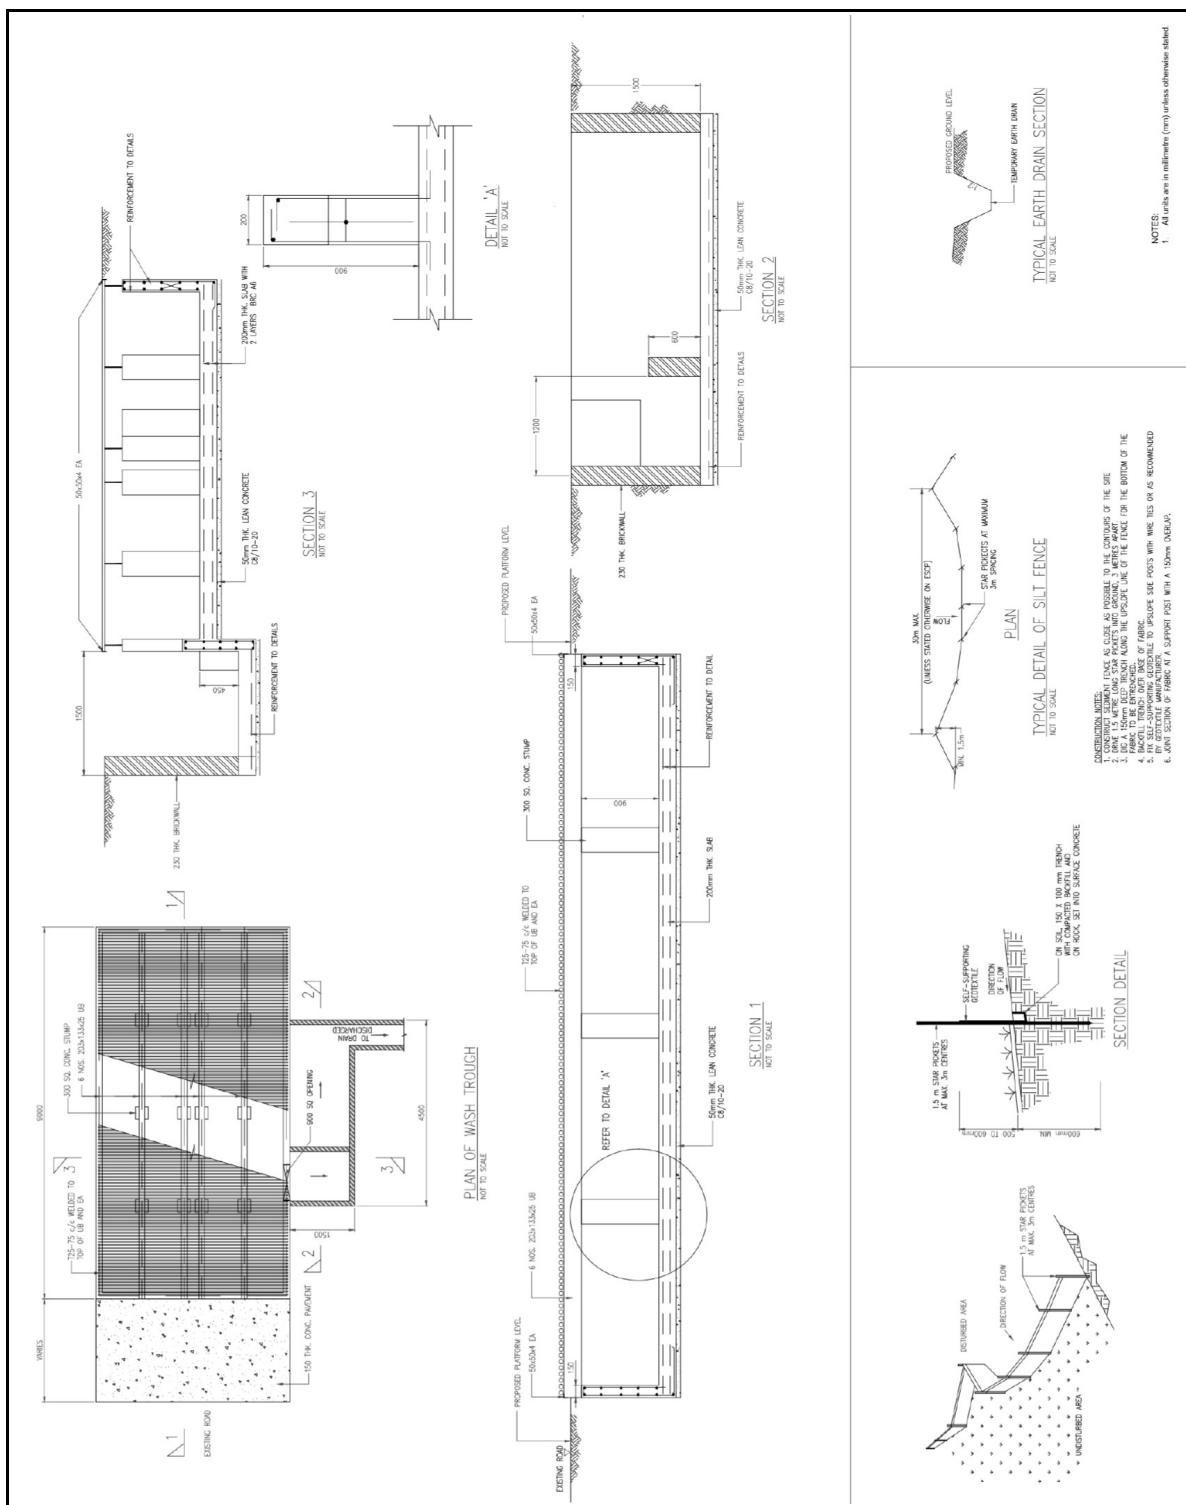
Proposed Silt Fence, Wash Trough And Temporary Earth Drain Details
